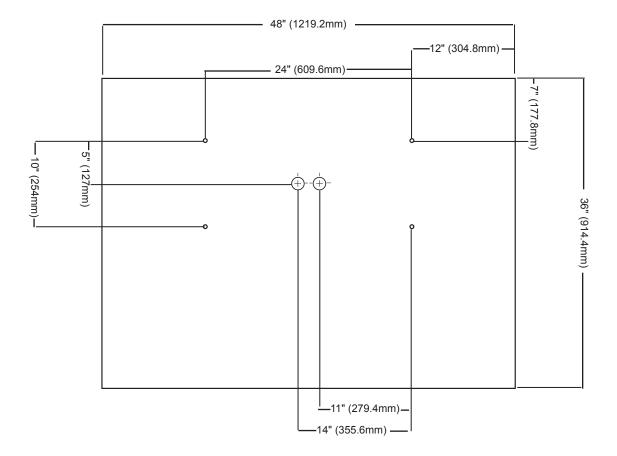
, Pour-In-Place Concrete Pad Installation
